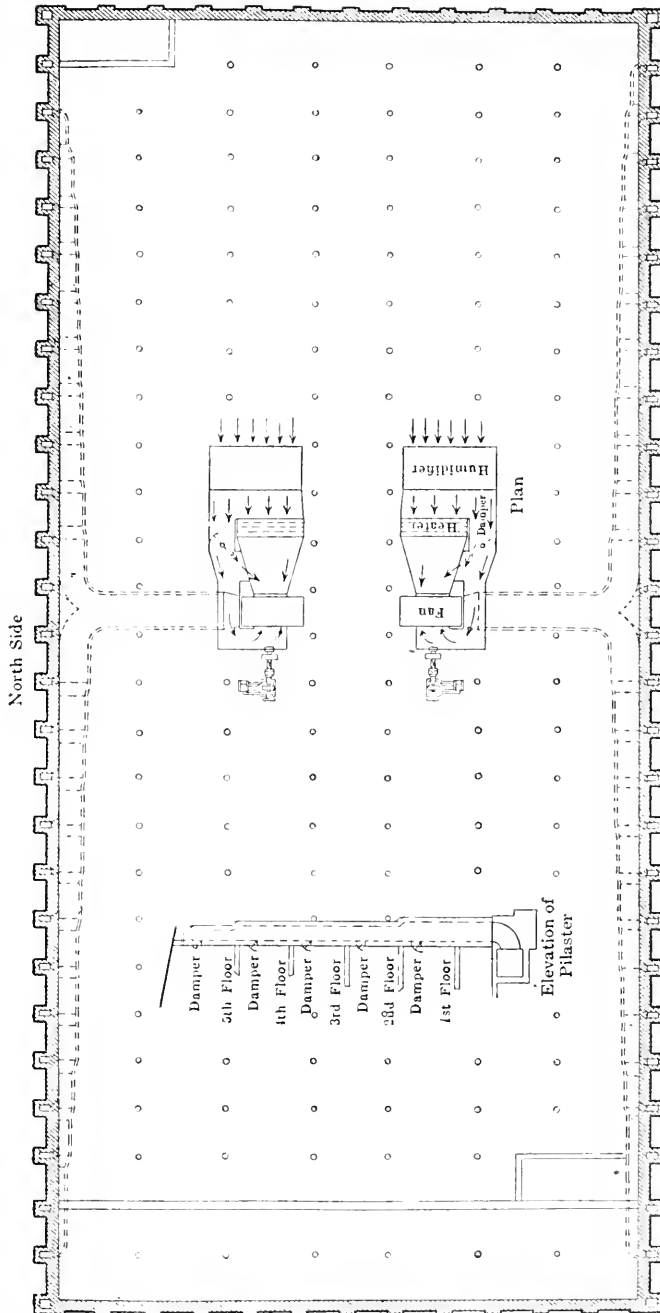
FACTORY SYSTEM WITH FAN AND HEATER IN BASEMENT. DUCTS IN OUTSIDE PILASTERS.
